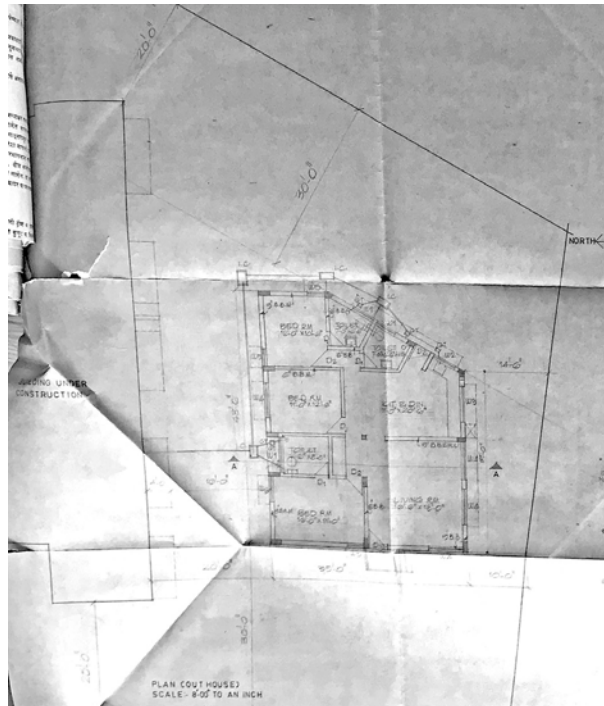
Three-bedroom outhouse of Jayanti Apartments, 1981.
